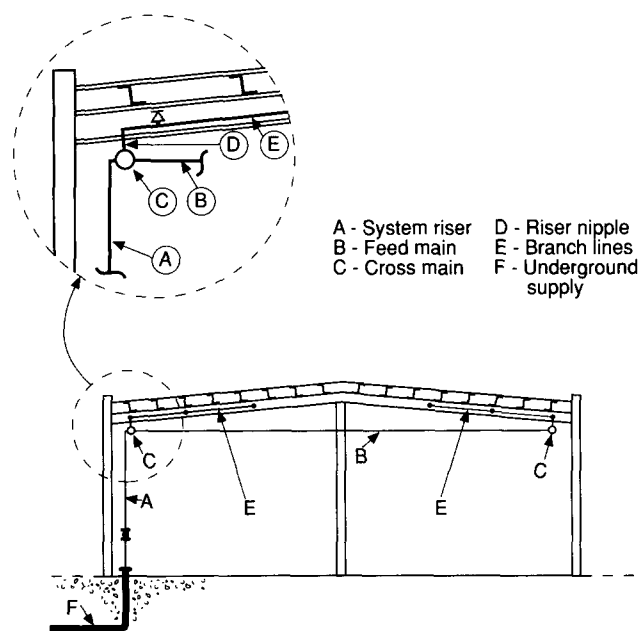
Building elevation showing parts of sprinkler piping system.
